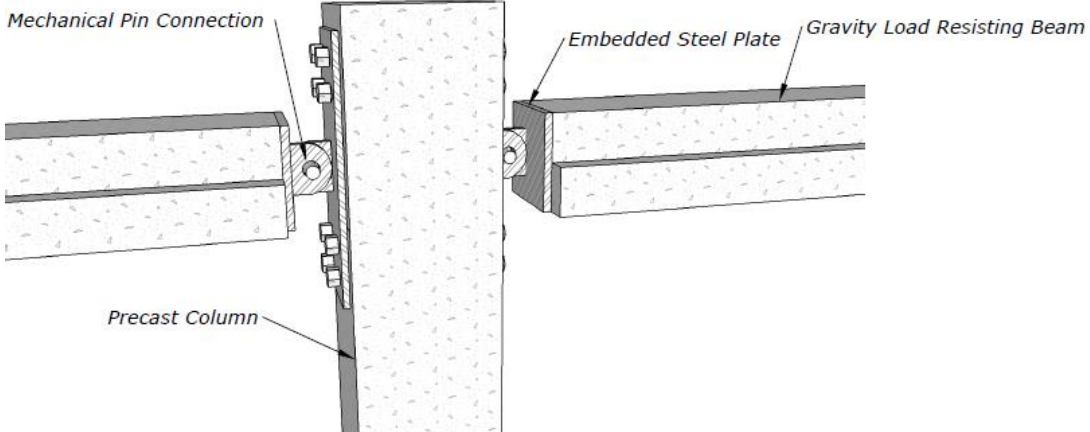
Gravity load resisting beam connected to precast column with use of mechanical pin
